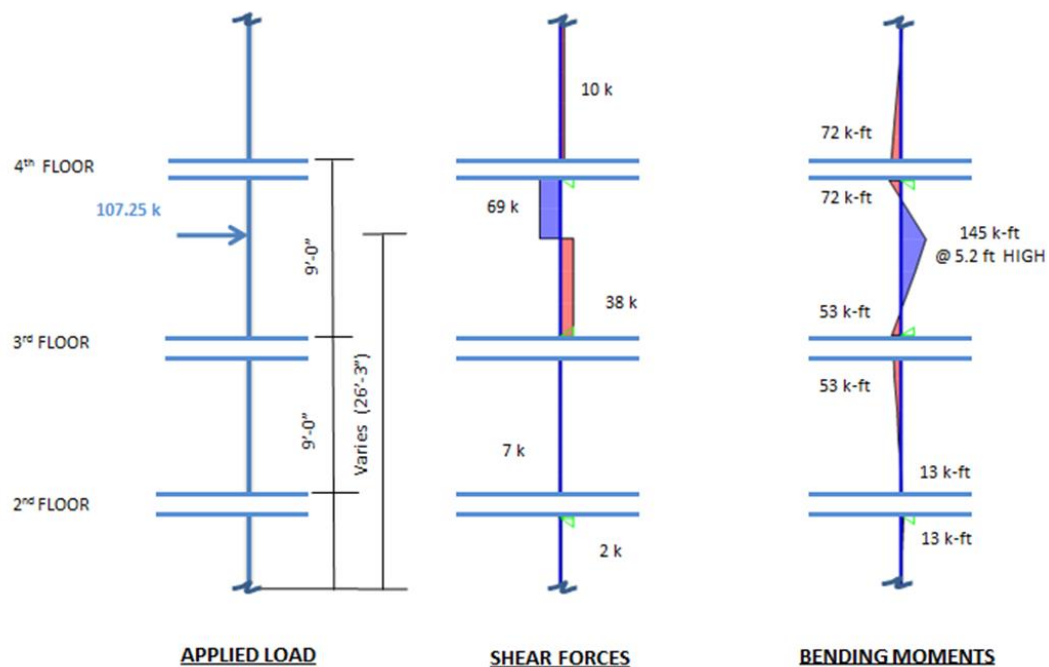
Impact load applied at " $d + h_c$ " away from the end of column on the 3rd floor
